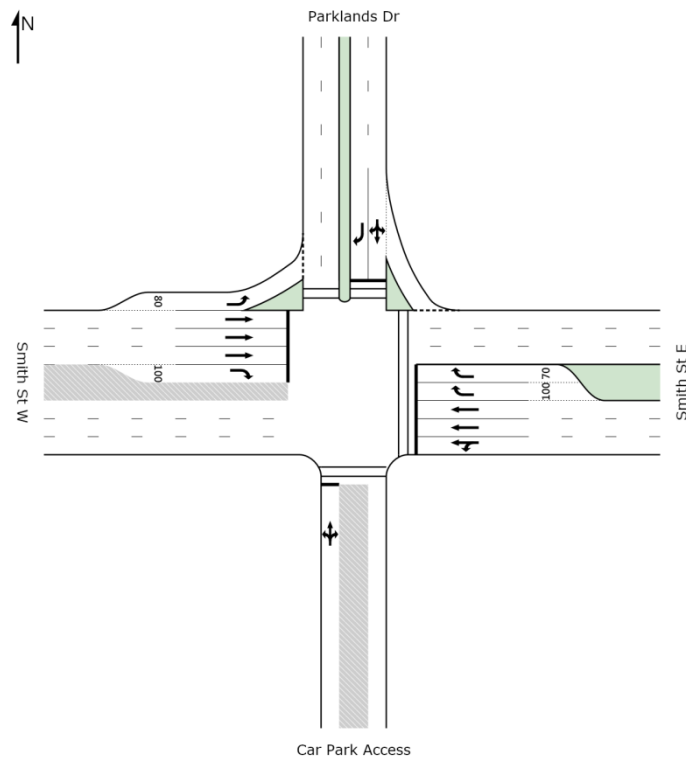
Smith Street / Parklands Drive – SIDRA Intersection Layout
